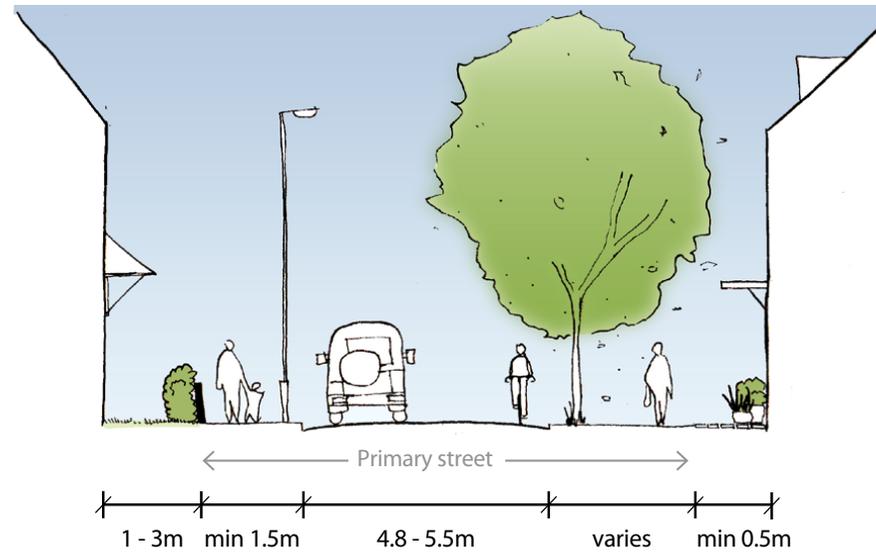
A-A – typical primary street cross section (refer to Fig. 16 for section location)
